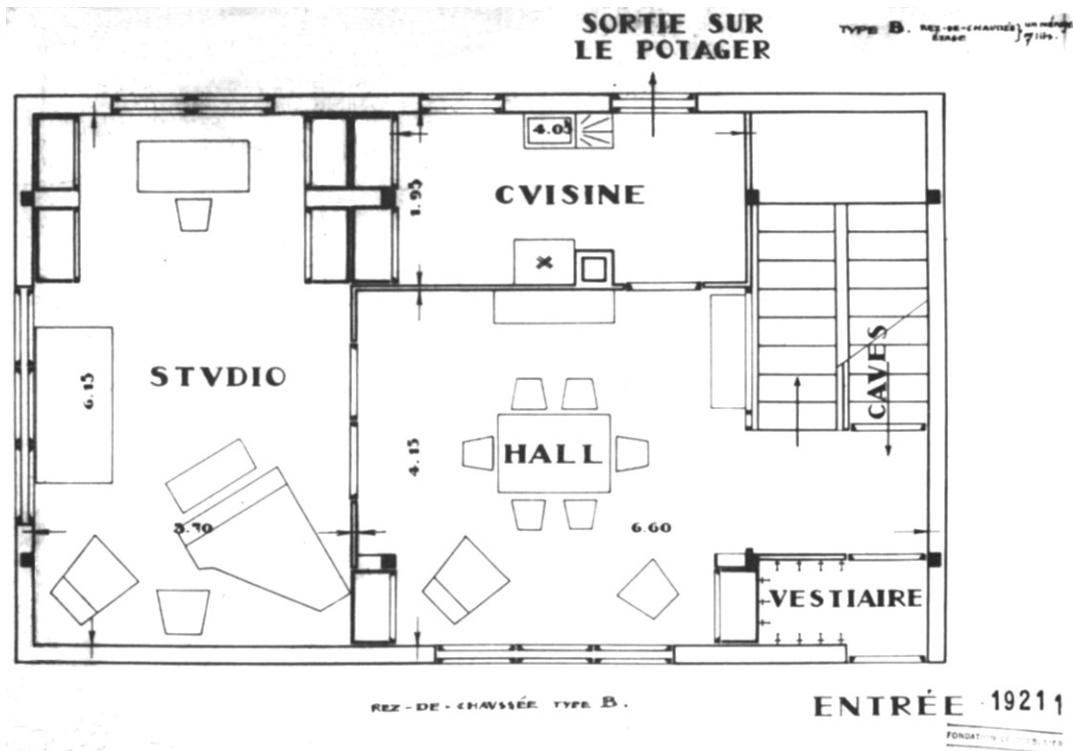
Maison Dom-Ino, 1915-1919, plan layout, ground-floor, type B
